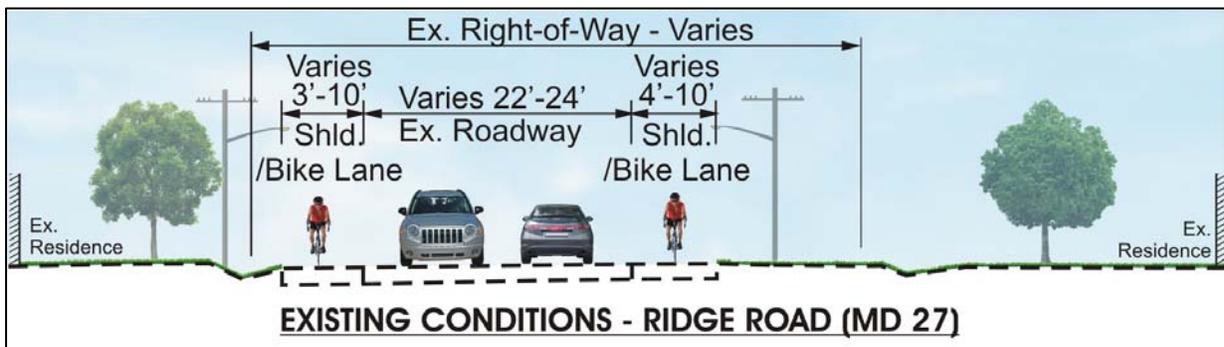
Alternative 1: No-Build, Typical Section, along Ridge Road (MD 27).
